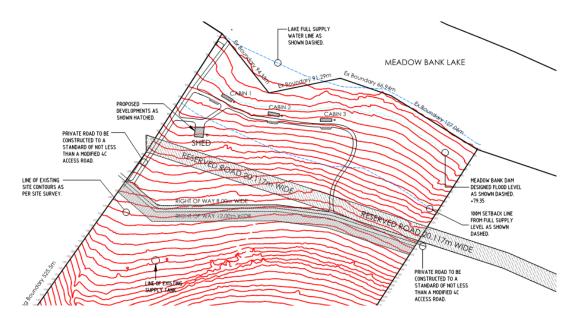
Plan of proposed development (Source: DA2022/05 StudioKo architecture design & drafting)
